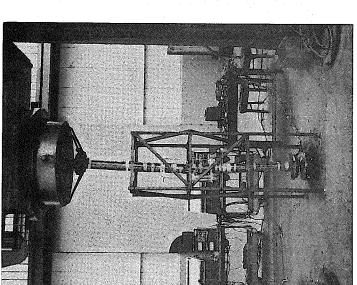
SPECIMEN 6, AFTER FAILURE
